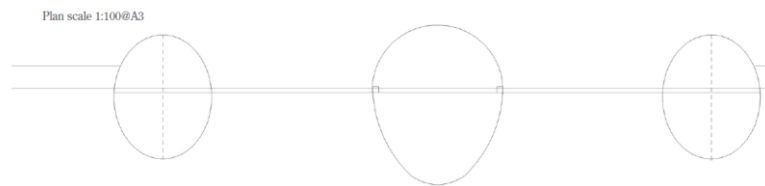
Plan of Hartley's granite piers<sup>48</sup>
